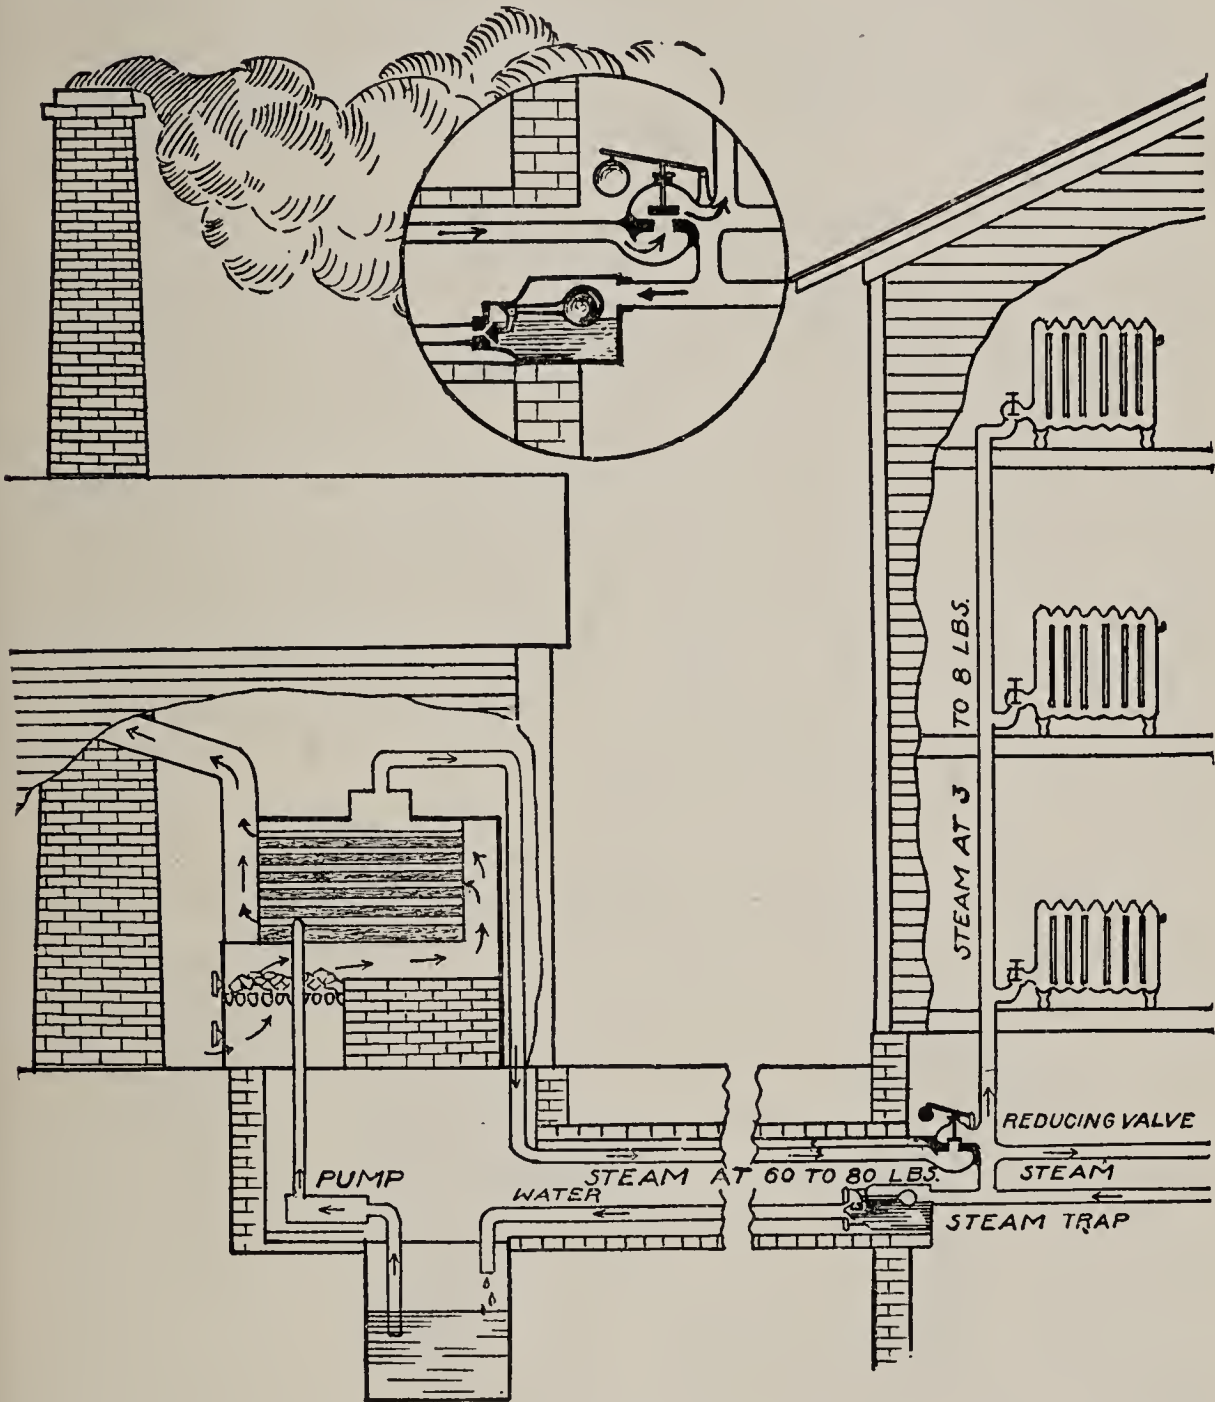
A steam heating plant. The steam trap and reducing valve are enlarged.
